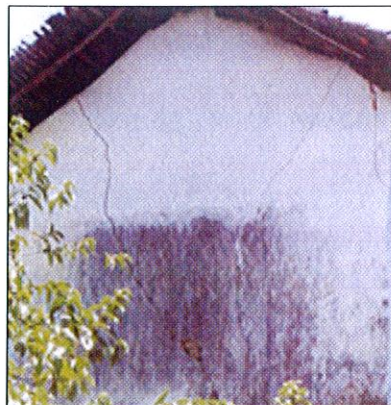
G2 Cracks (a) Diagonal wide cracks in gable wall
